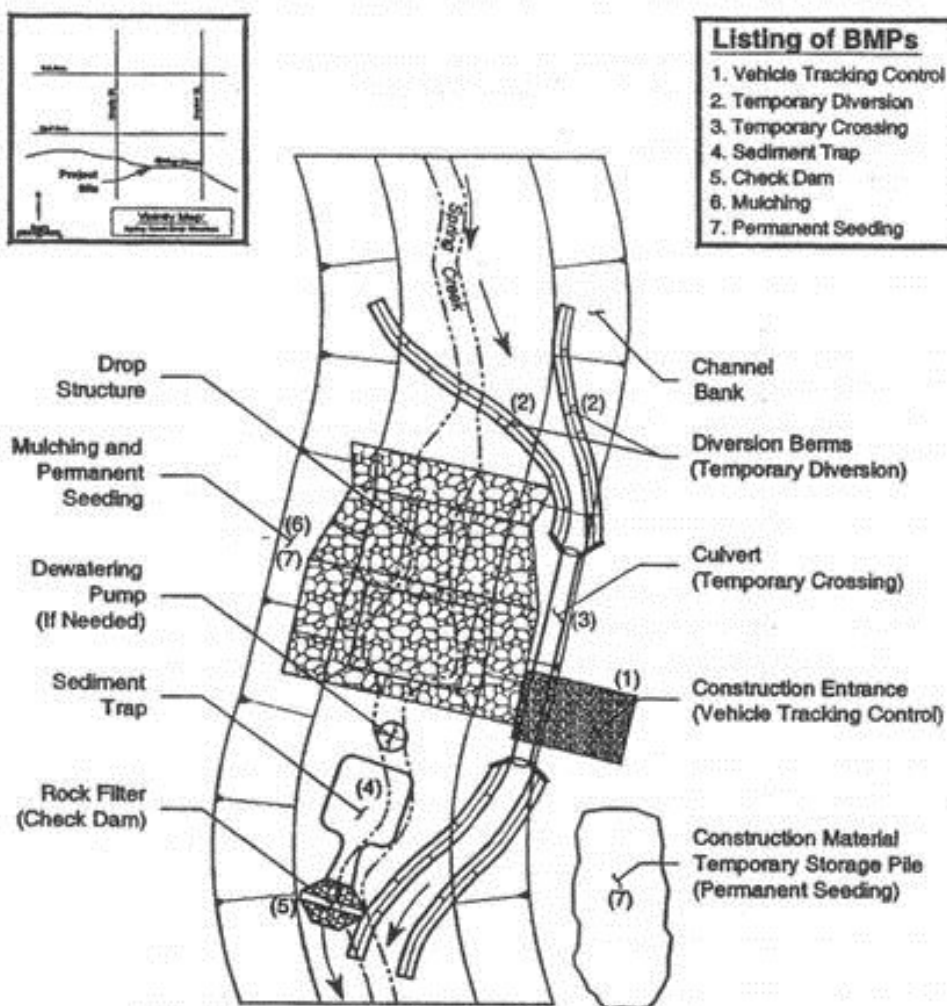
Example Site Plan showing BMPs for 401 Certification Project
